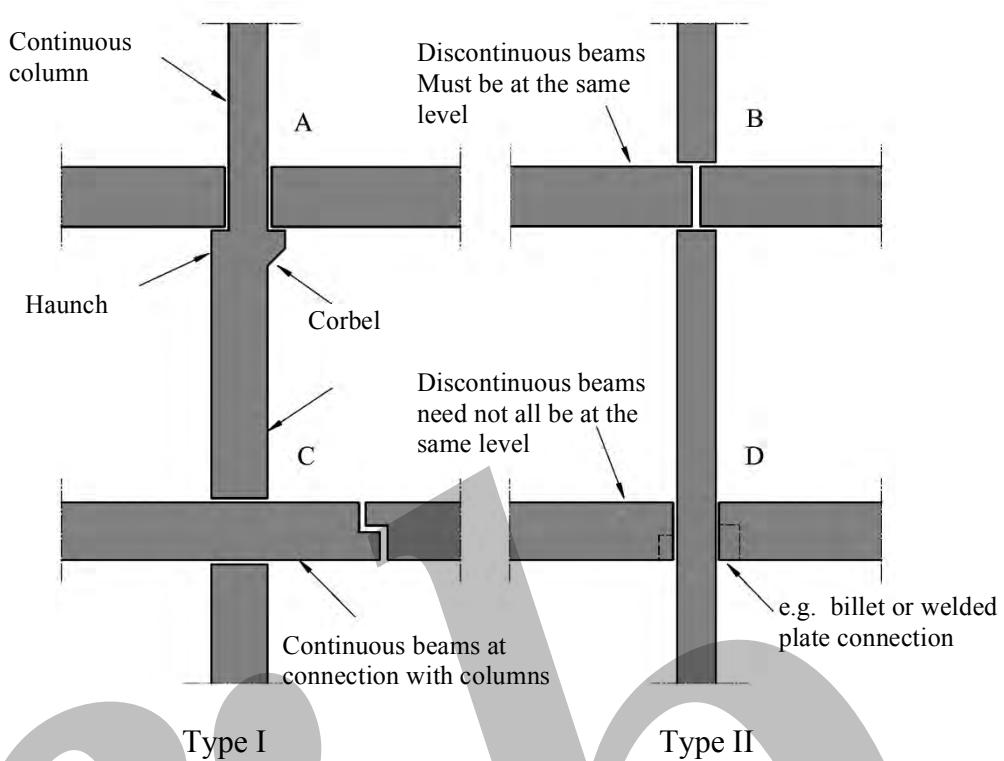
Types of beam-column connections. A: beam-end-to-column corbel; B: beam-end-to-column head; C: continuous beam-to-column head; D: beam-end hidden connection to continuous column;
